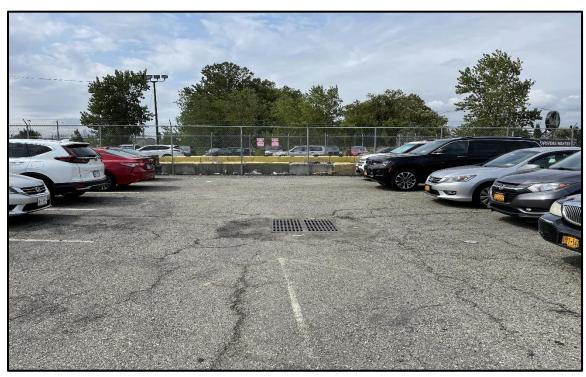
Facing west in the northern portion of the site; general wear shown in the paved parking lot surrounding the storm drain.
